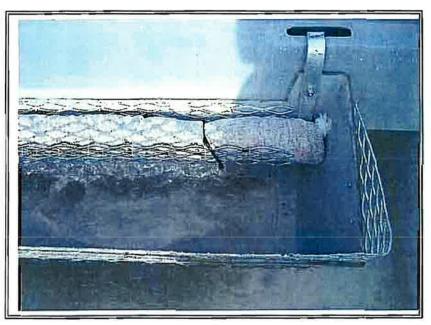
Curb Inlet hook hanging in slot on test bed
